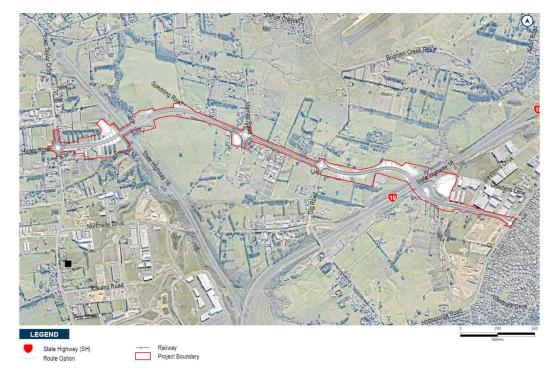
Overview of New Spedding Road West (west of Māmari Road)
